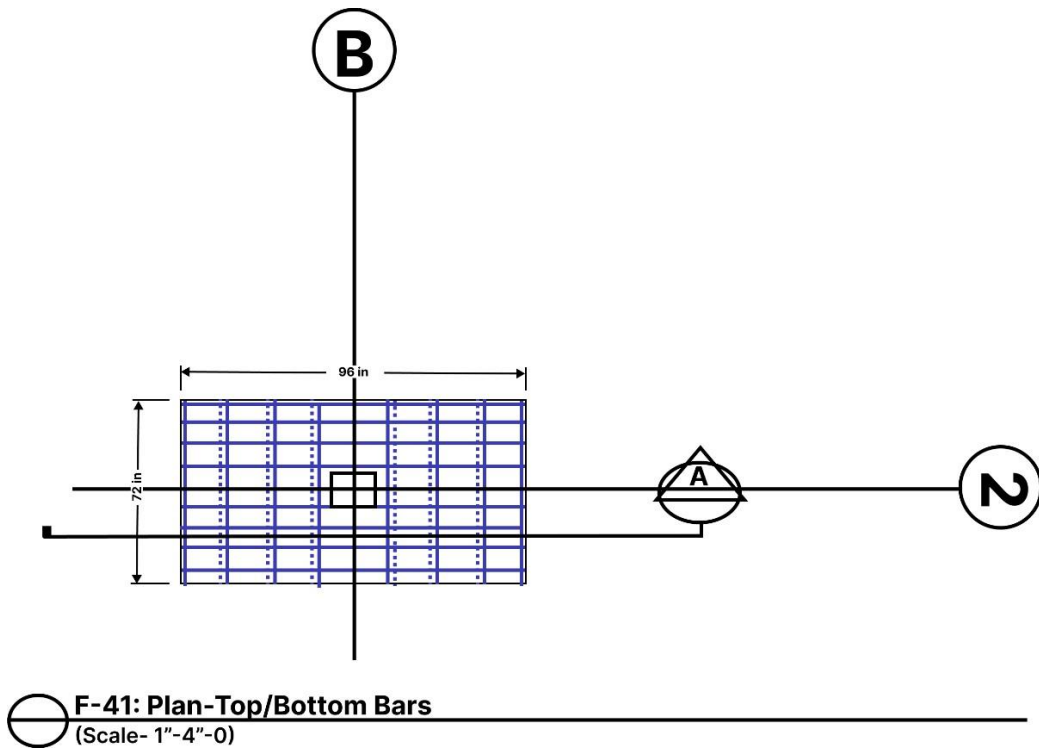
F-41 Plan all bars Top/bottom Bars
